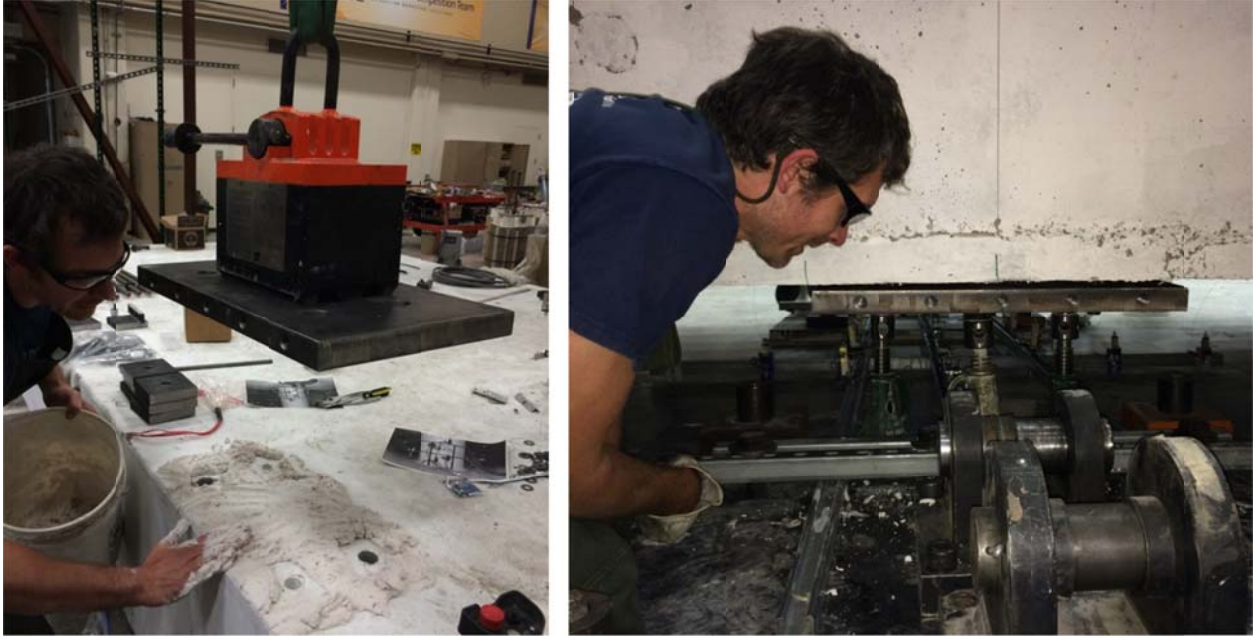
Installing the top (left) and bottom (right) plates used as part of the vertical strut connection at one of the bent cap beam ends
